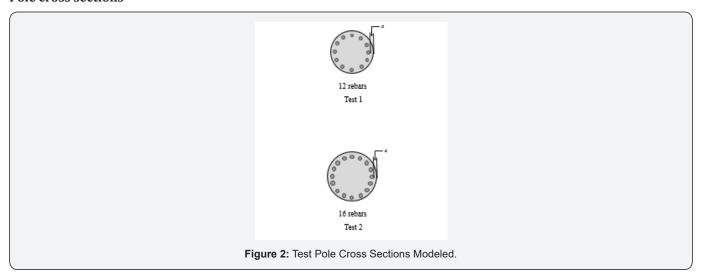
shows pole cross sections associated with different test configurations of rebars. Two (2) cross sections with 12 and
